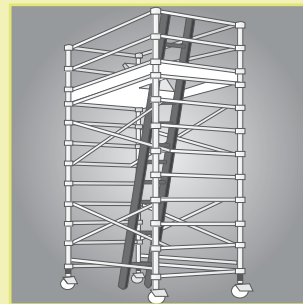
Mobile scaffold with an access ladder and a trapdoor to provide the largest possible hazard-free working platform
